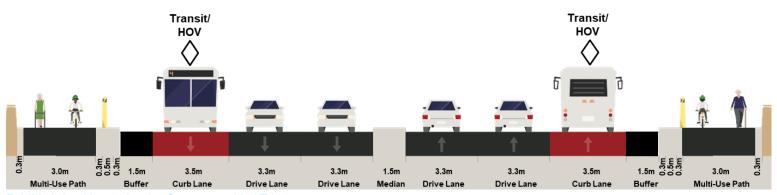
Alternative 3 - Overpass with AT Improvements
